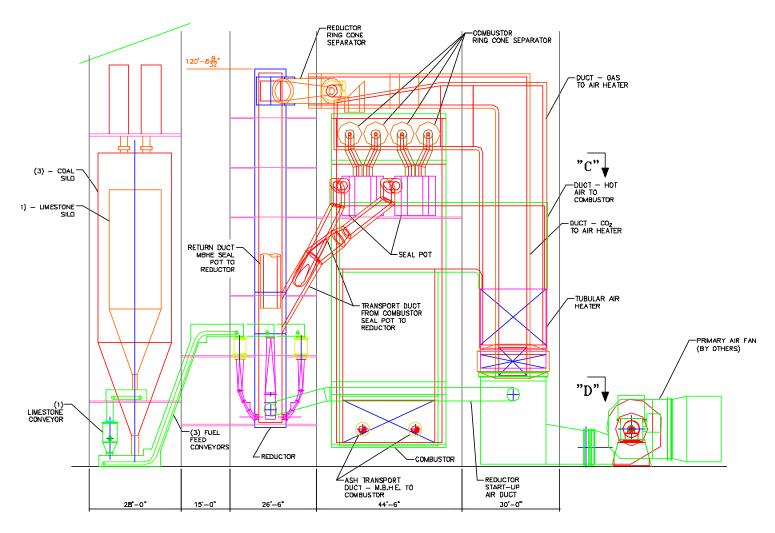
2: Case-7 Boiler Island General Arrangement Drawing – Side Elevation
